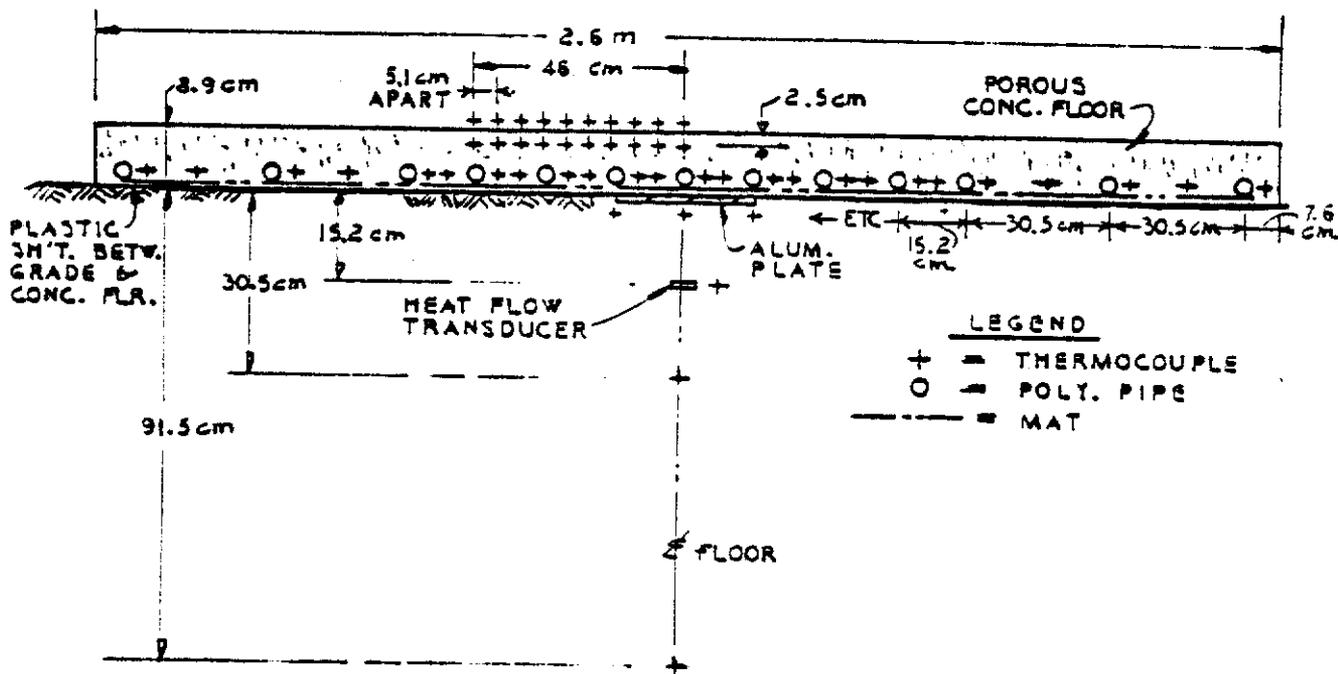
CROSS SECTION OF POROUS CONCRETE FLOOR SHOWING PIPE, THERMOCOUPLE & MAT LOCATIONS
